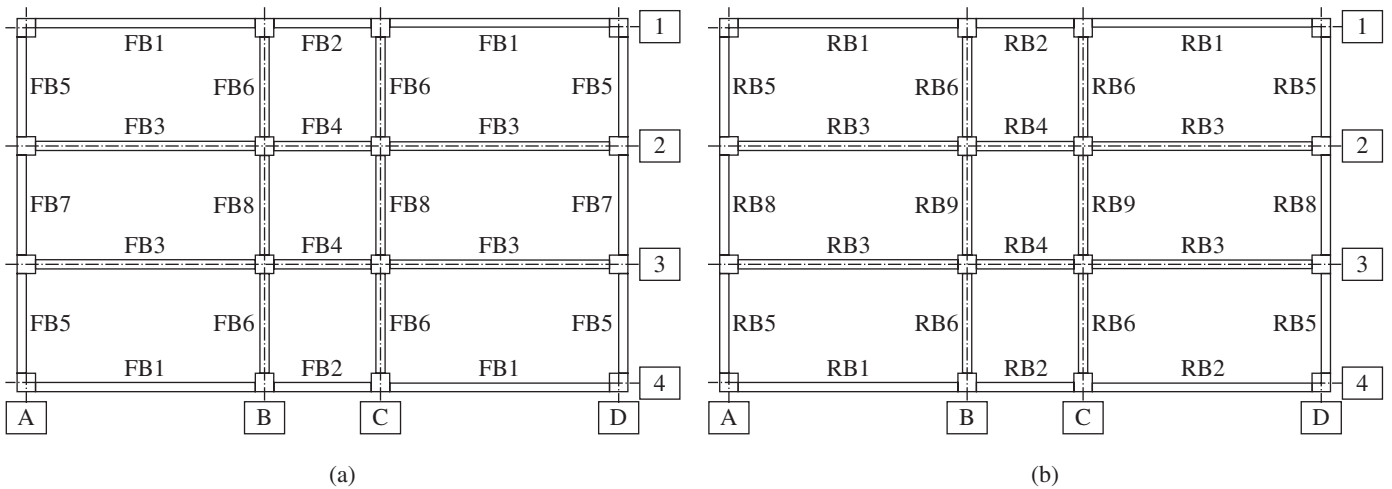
Beam layout (a) First to sixth floors (b) Roof
